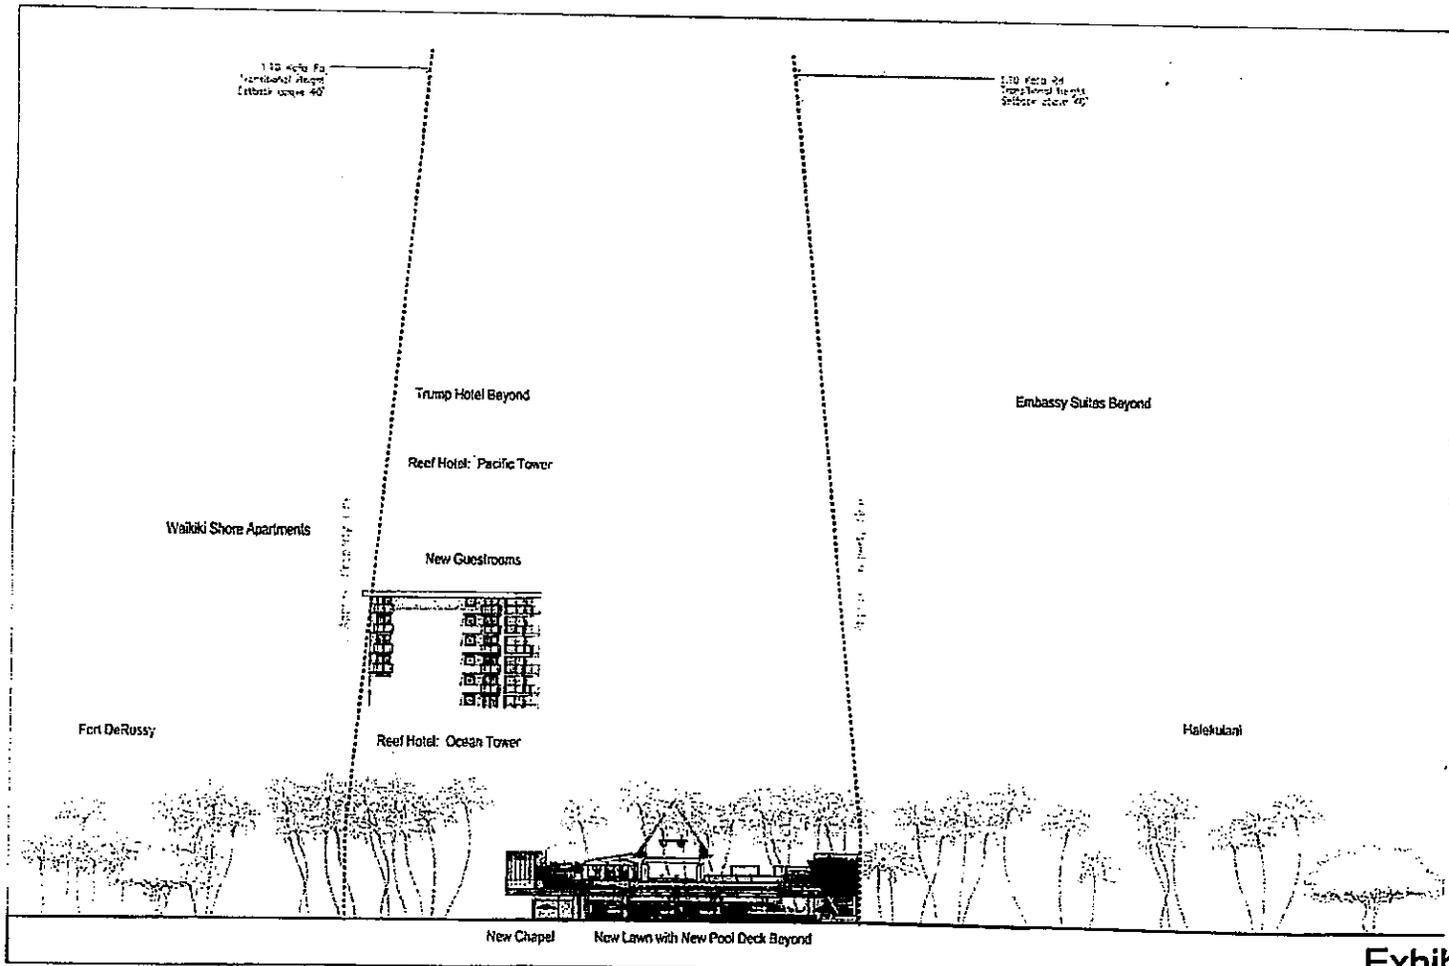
Site Elevation 1 (Makai Looking Mauka)
